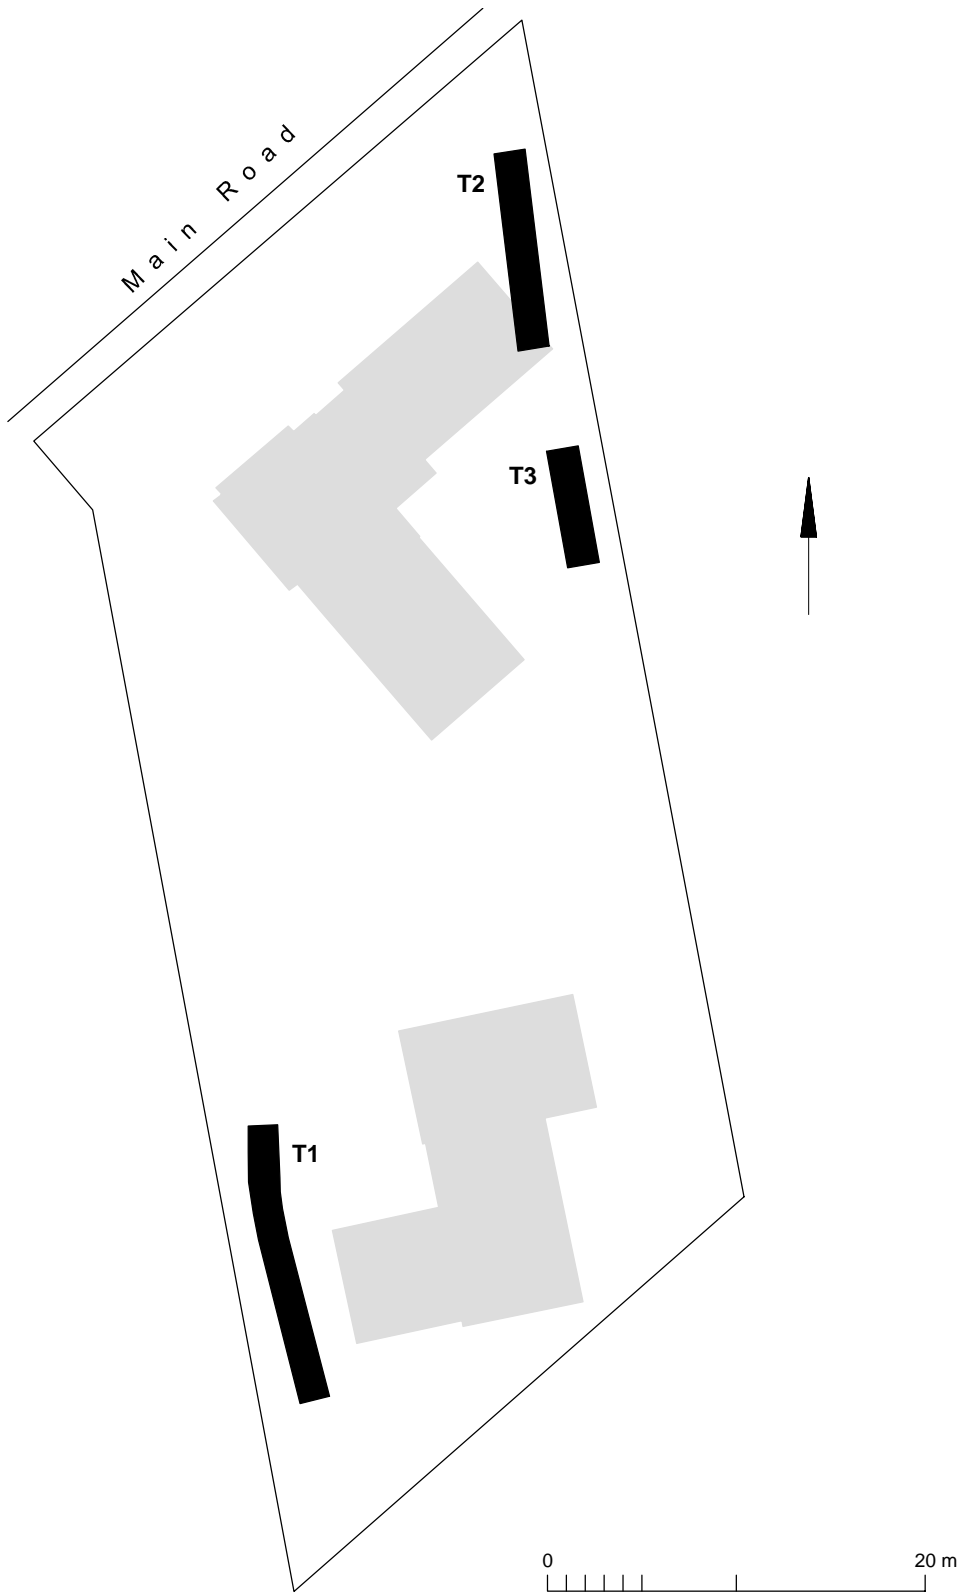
Plan of site, showing location of trenches and footprints of the two proposed residential blocks (toned).
